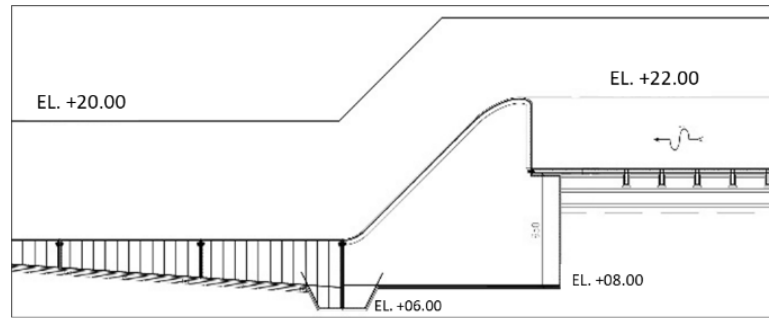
The initial spillway foundation design at elevation +6.00 and +08.00 without considering sub surface condition
